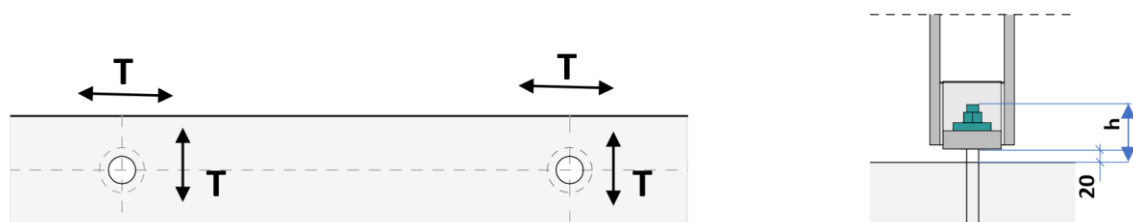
Installation dimensions and tolerances for RPP-E base bolts
